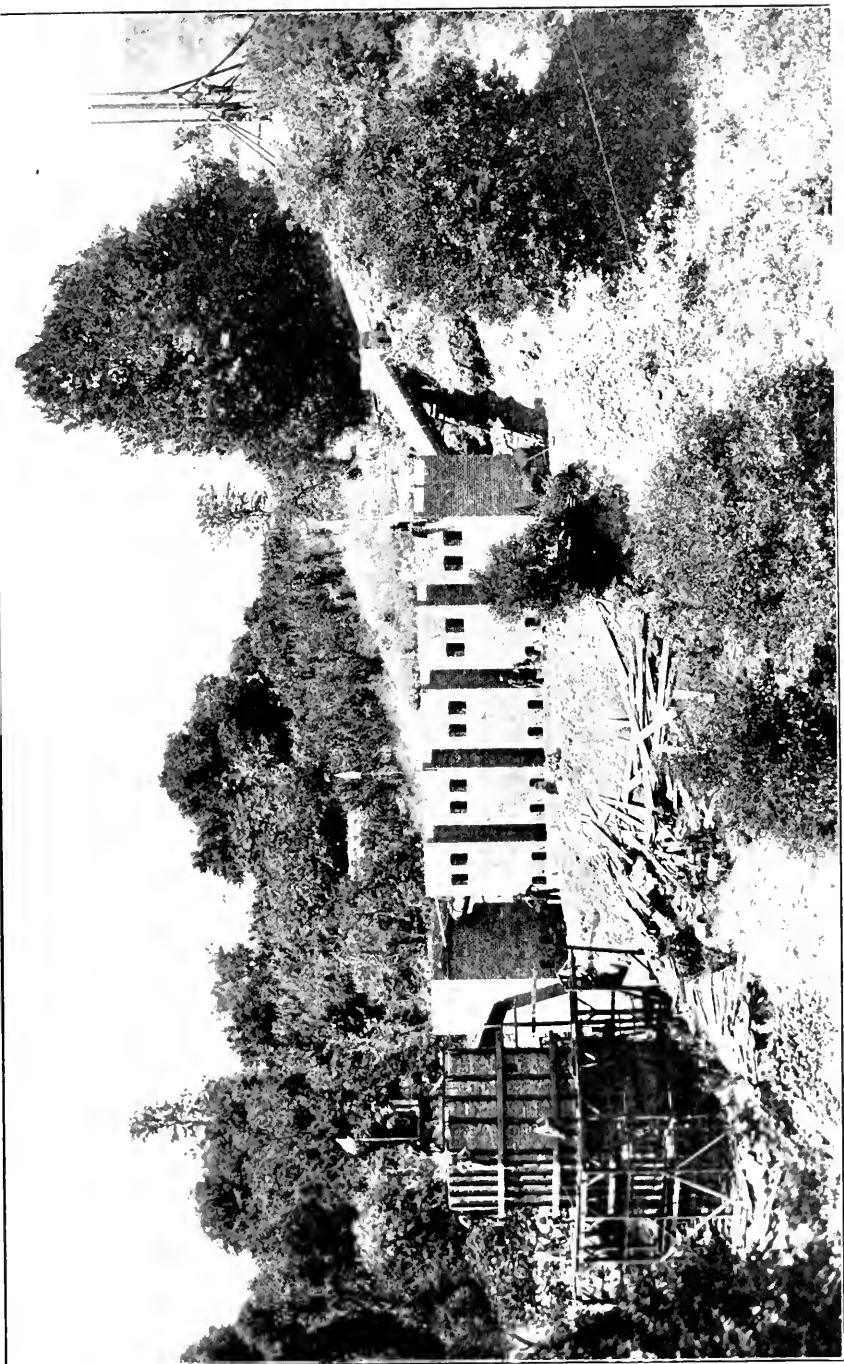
REDUCTION PLANT IN COURSE OF CONSTRUCTION. SILVER CREEK QUICKSILVER MINING CO., SANTA CLARA COUNTY.
